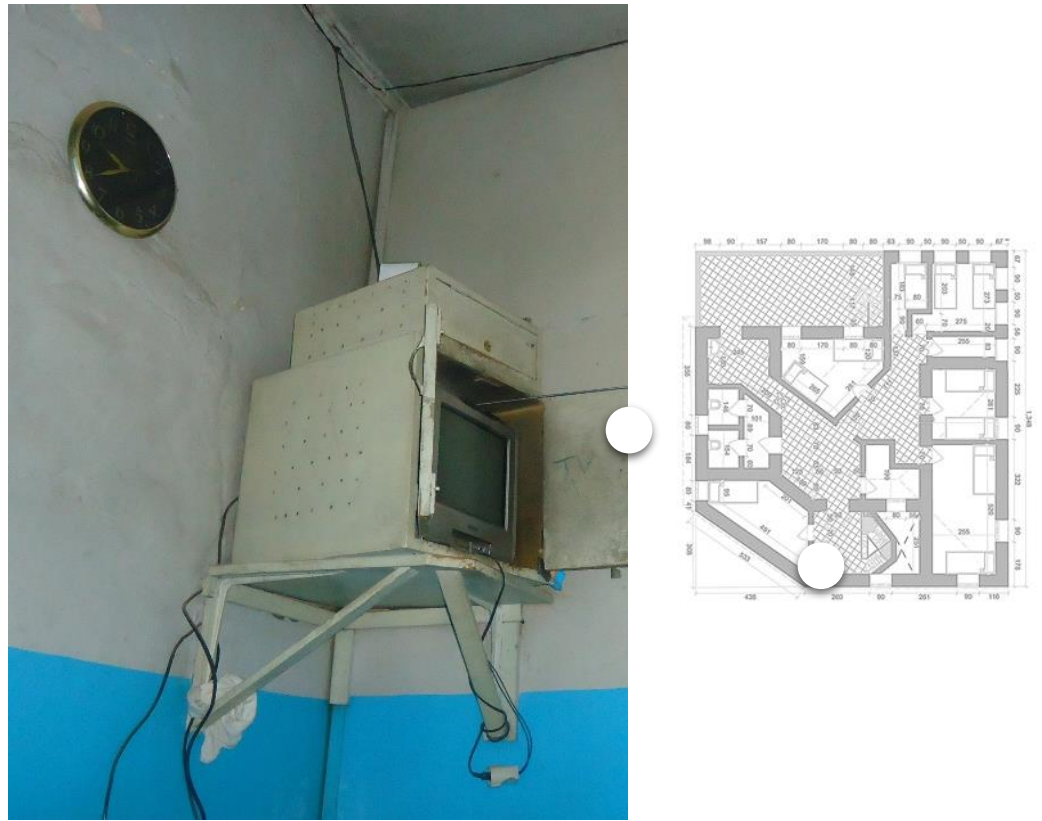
Unprofessional alteration on the wall (TV stand mounted to the historic wall)
